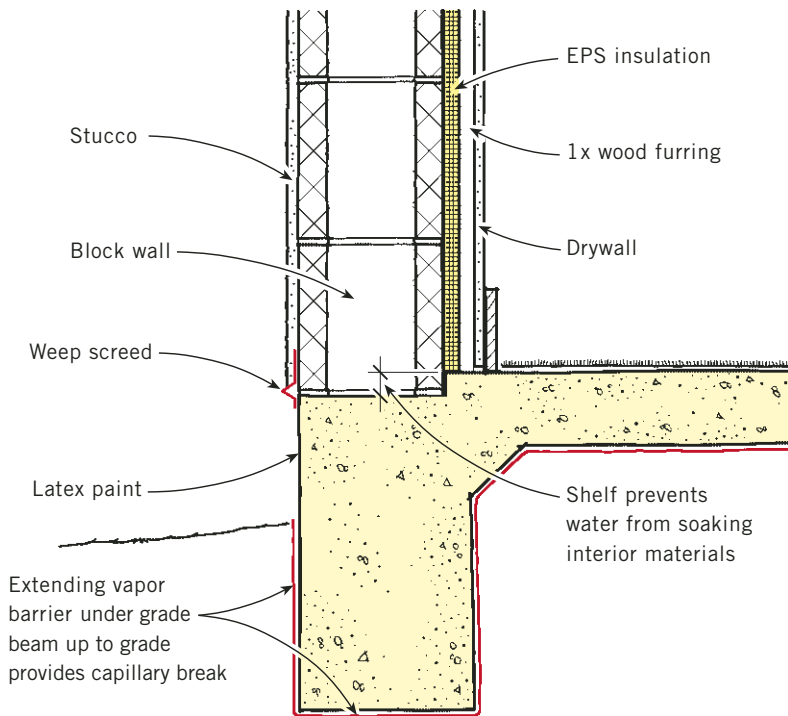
MASONRY WALL DETAILS. To manage water that builds up in a leaky block wall, form a step in the foundation edge to direct water that reaches the base of the wall outward, rather than allowing it to seep inside, where it can damage flooring. Isolate a potentially wet masonry wall from interior drywall with a continuous layer of semipermeable foam, such as extruded polystyrene (EPS) and strapping. EPS foam, rather than more impermeable XPS or polyisocyanurate, will allow the wall to dry to both the inside and the outside over time.
